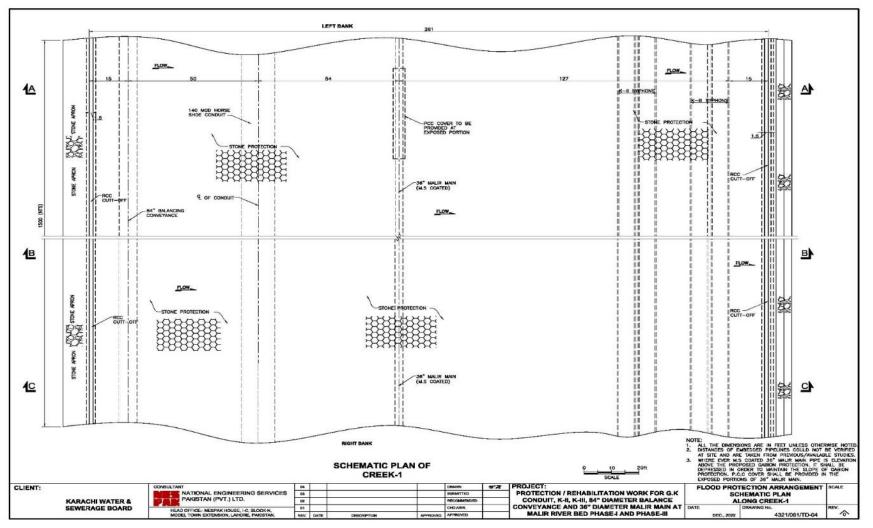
Flood Protection Arrangement Schematic Plan (Creek 1)
